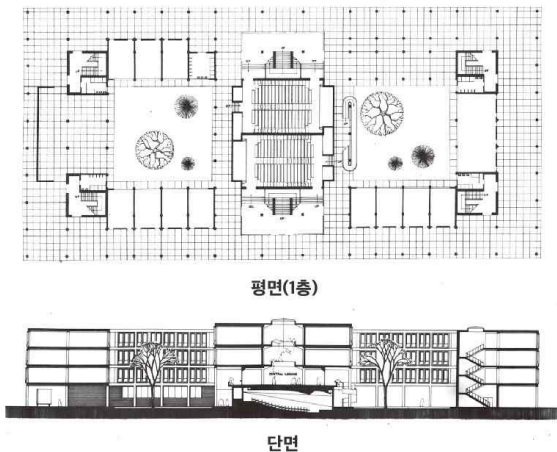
A Plan and Section of Typical Classroom Building of Yoon's Campus Plan (source: Same as Figure 3)
